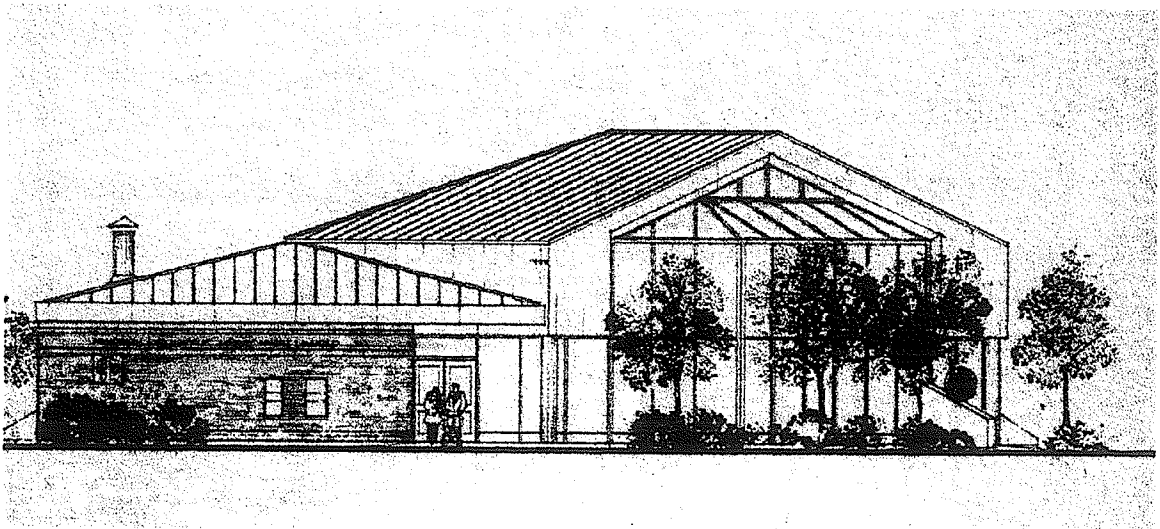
Architect design drawing, West Elevation. Courtesy of the architect.
